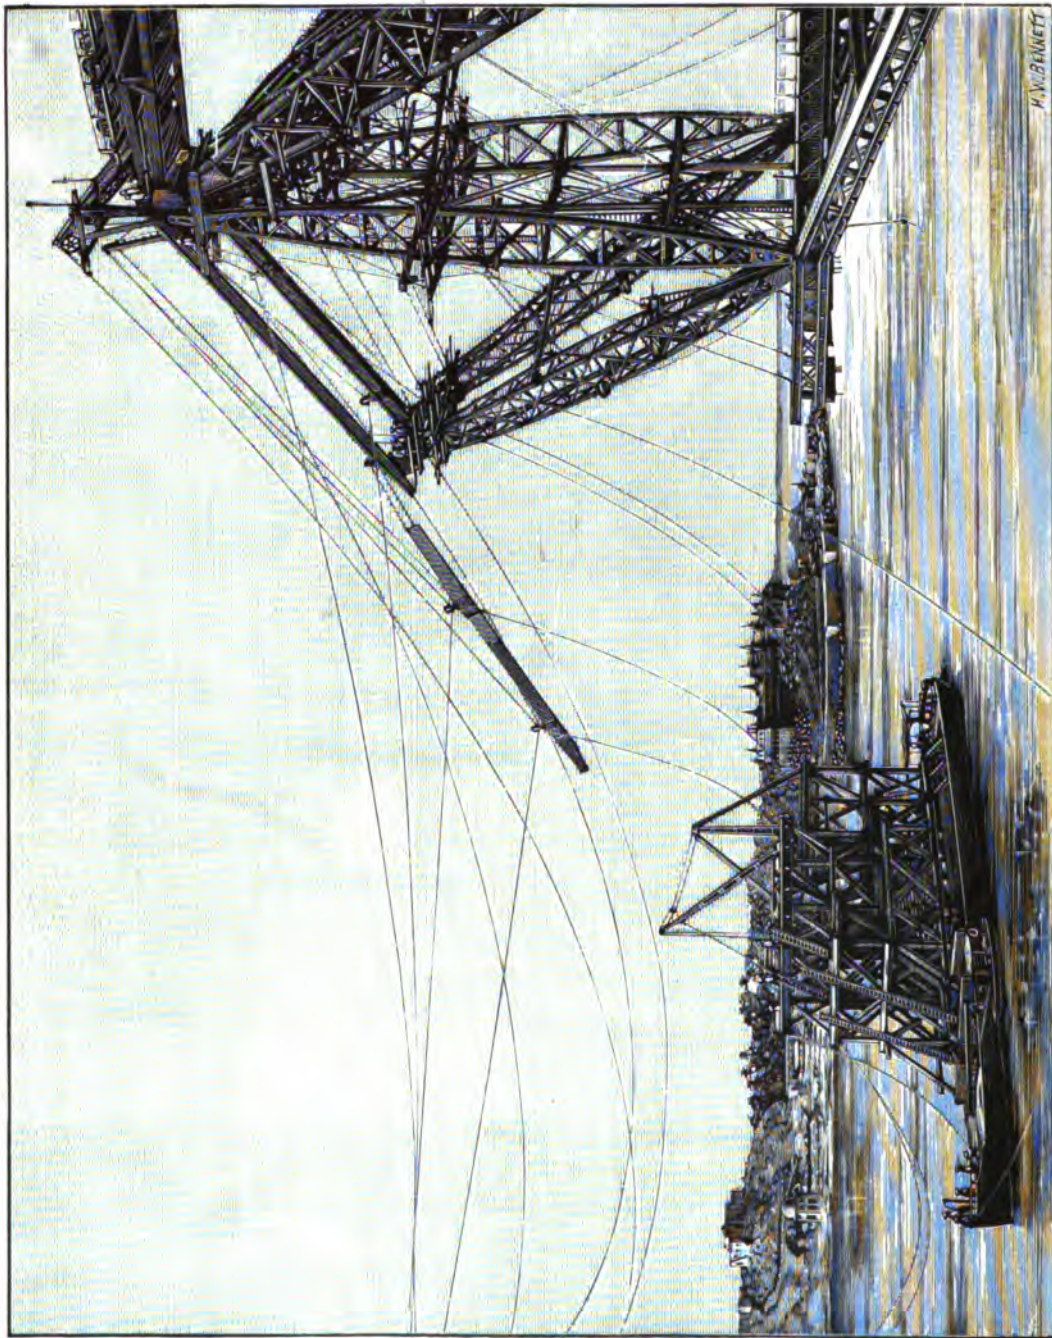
ROPES USED IN THE ERECTION OF THE SUKKAR BRIDGE.
